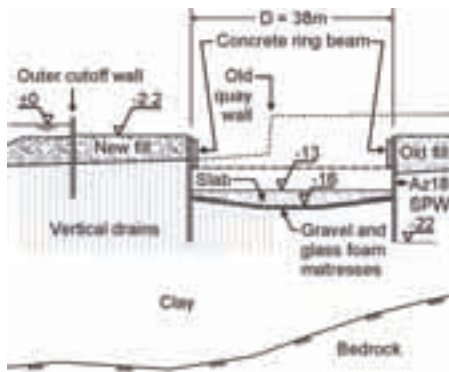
Cross section through cylindrical excavation for Oslo Opera
